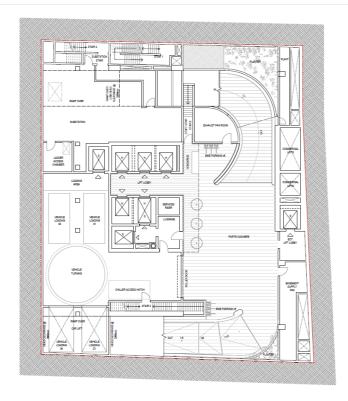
| Proposed basement level 1 (Source: Woods Bagot)
